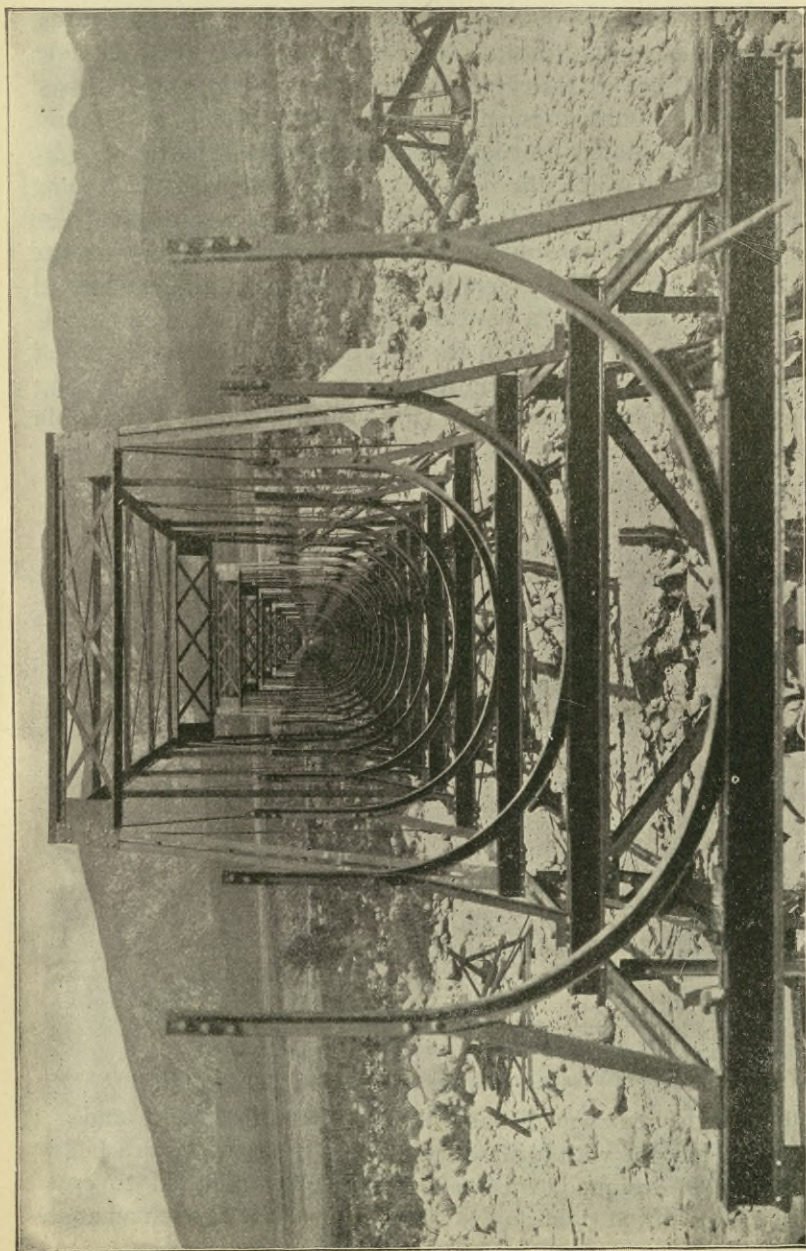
PLATE II.—MILL CREEK FLUME AND STEEL BRIDGE, SANTA ANA CANAL.
